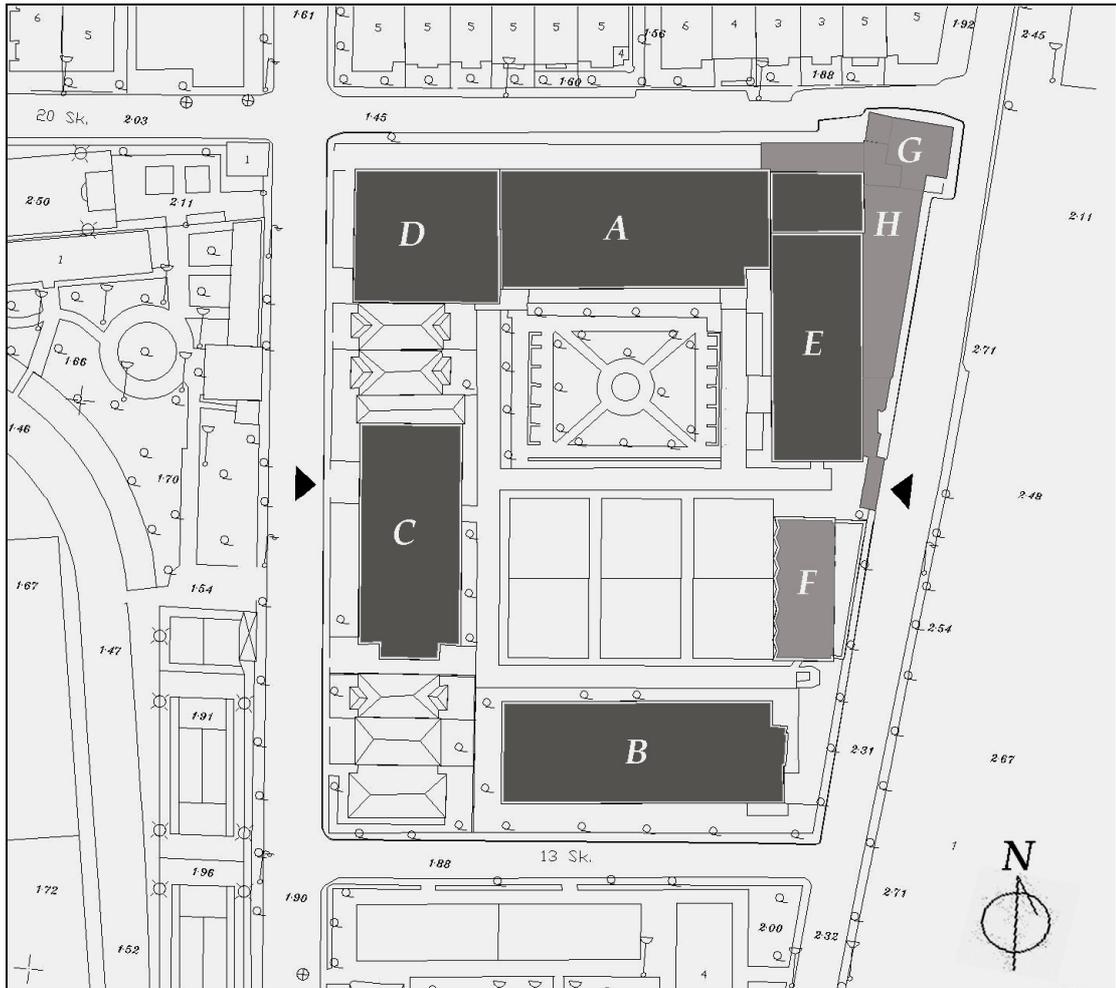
Fatih ES site plan, A-Elementary school building, B-High school building, C-Administration, D-Extension unit, E-Dormitory and cultural center, F-Seats, G-Employees' residences, H-Ateliers.
